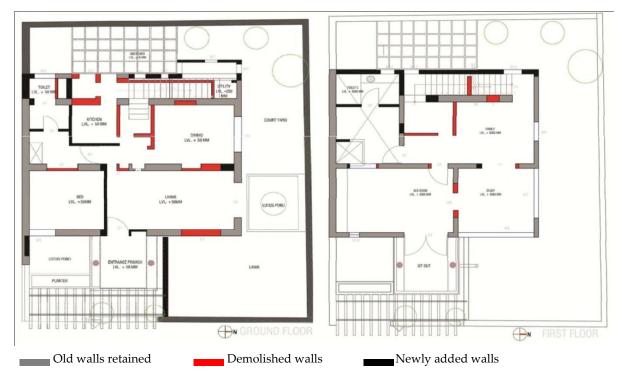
Floor Plans (Left: Ground Floor, Right: First Floor)
